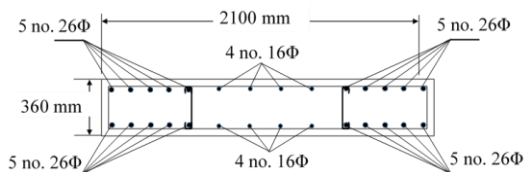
Reinforcement detailing for RC wall of the 6 storied HCW system [11]
